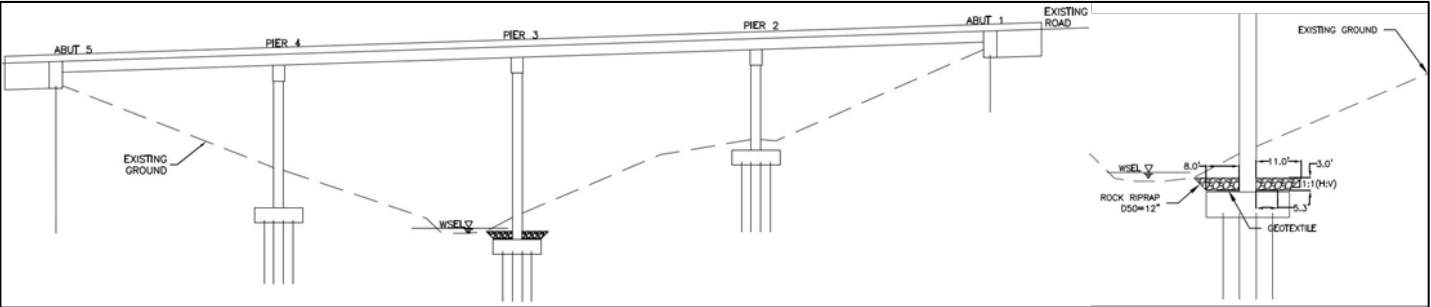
Cross-sectional view of Bridge F-09-AF with recommended hydraulic scour countermeasures (left) and detail of pier protection (right)
